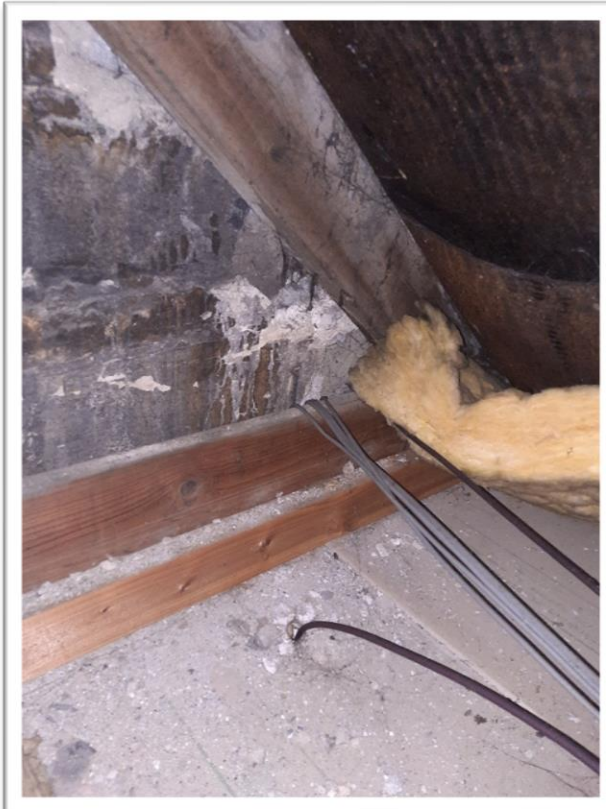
Missing thermal insulation in the attic ceiling on the horizontal plane. Poorly fitted thermal insulation on sloped section of ceiling. Evidence of damp ingress at gable wall.
